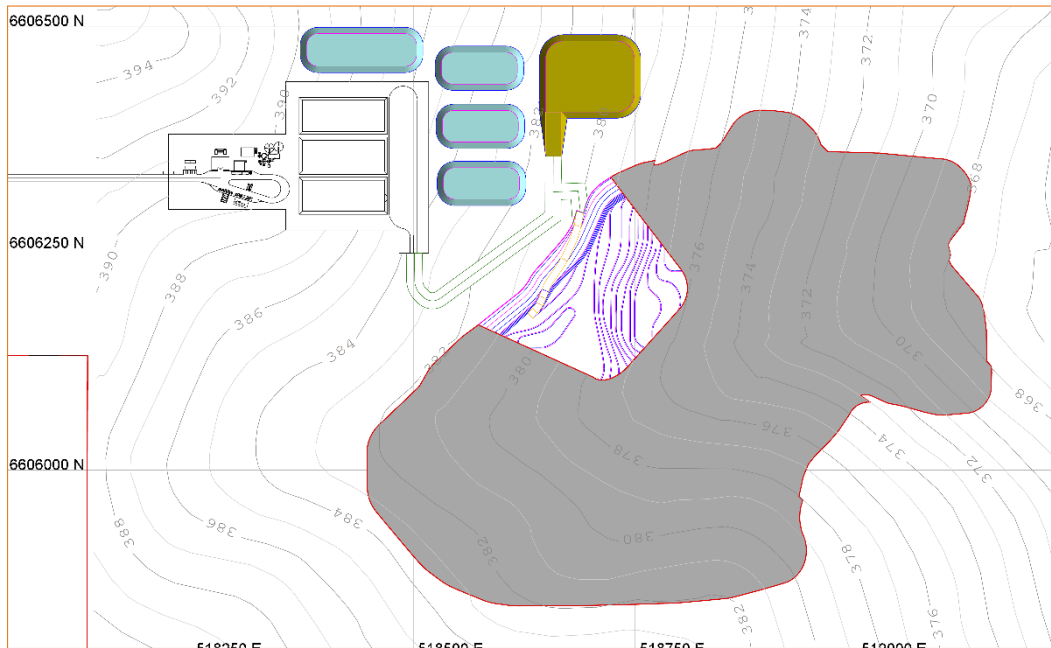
Cadoux site layout – end of last mining campaign (Life of Mine)
